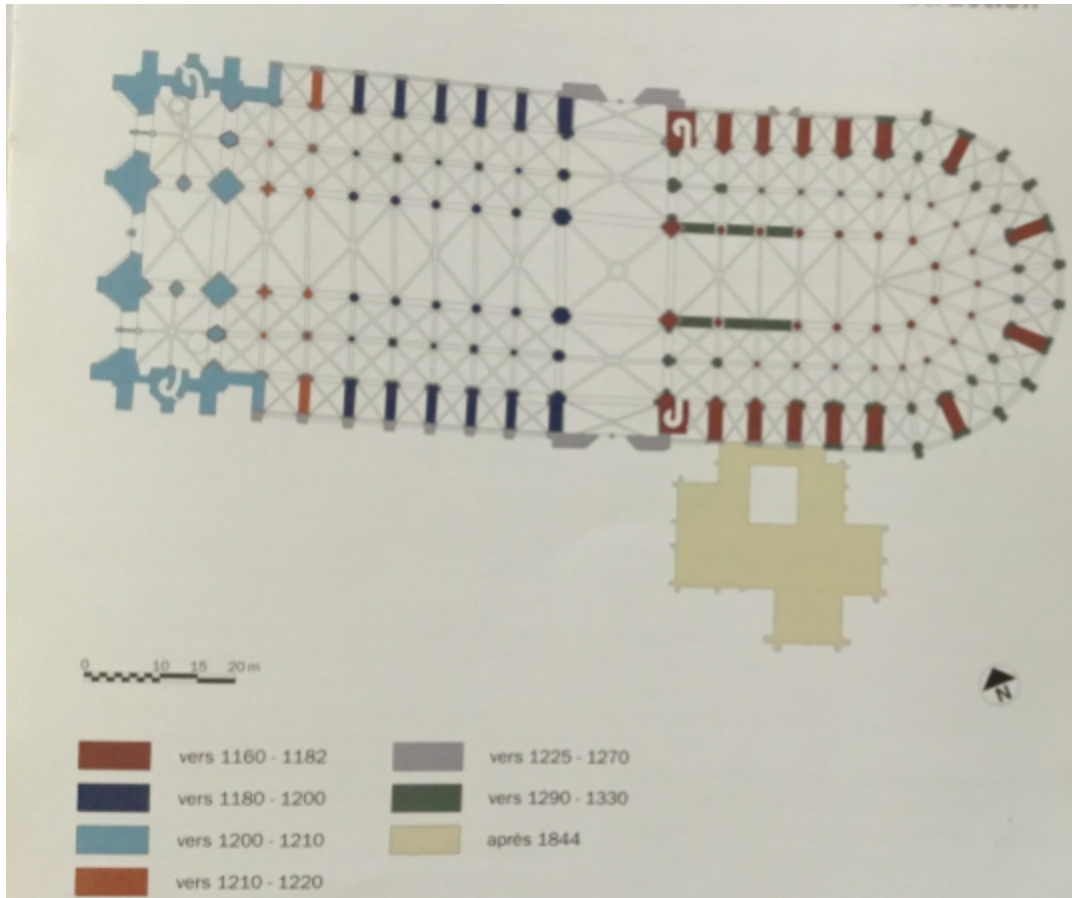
Notre-Dame floor plan with Tallon and Sandron construction dates. Image credit: Tallon and Sandron, *Notre-Dame*, 193.
